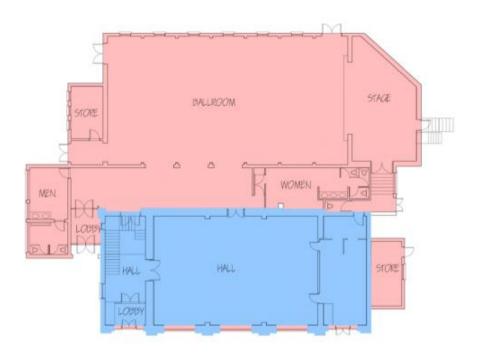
Existing Ground Floor GA Plan; Red = Demolish, Blue = Refurbishment (Not to scale)
